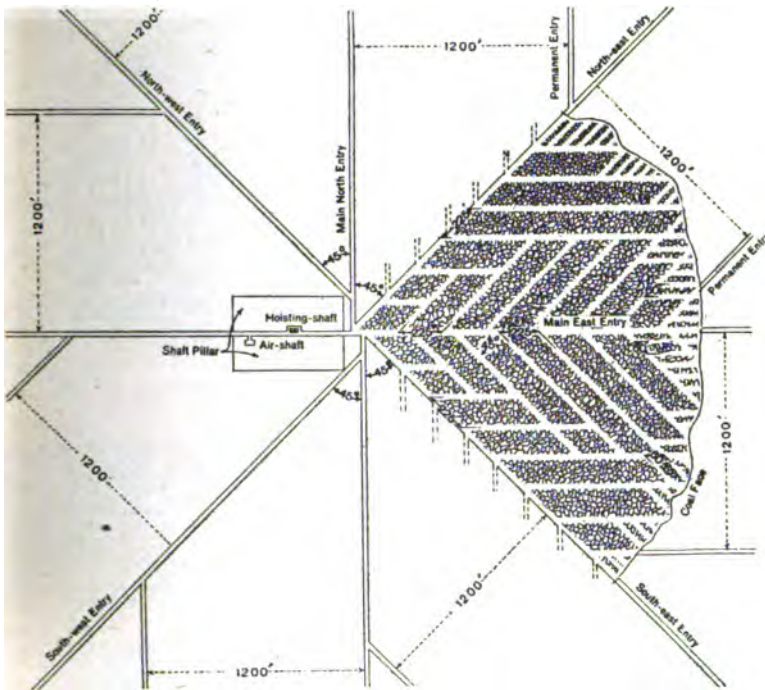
Plan of long wall development. (Illinois Coal Mining Investigations.)
